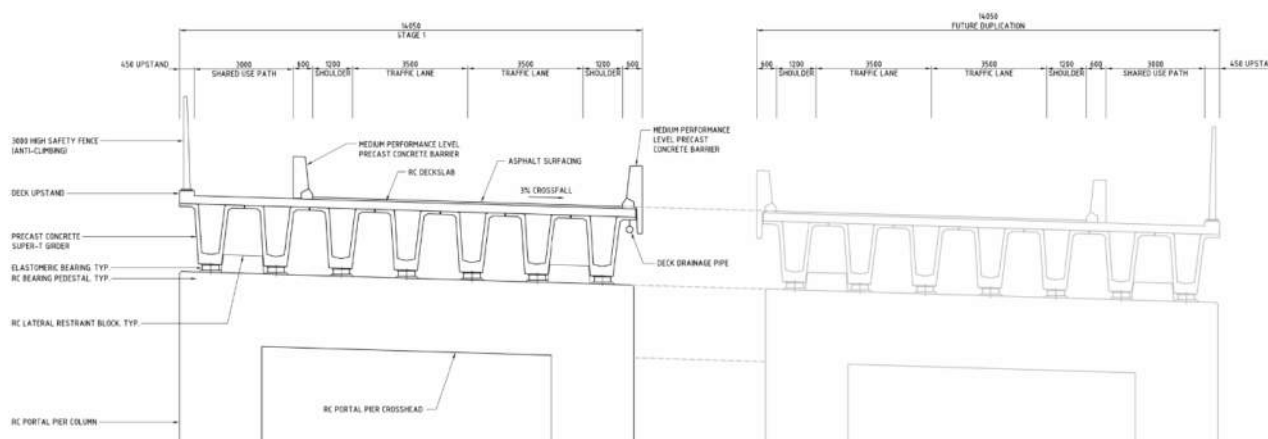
Concept Bridge cross section showing interim and ultimate configurations
